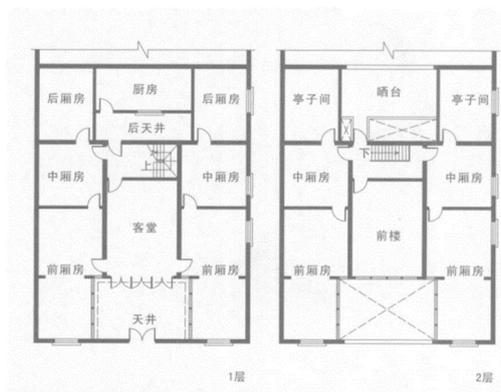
The floor plan of Gongshunli Source: Shanghai housing after its opening to foreigners
